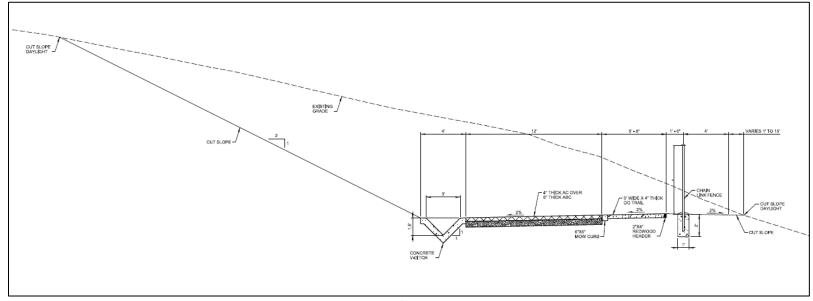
Cross-Section of Permanent Project Access Road
